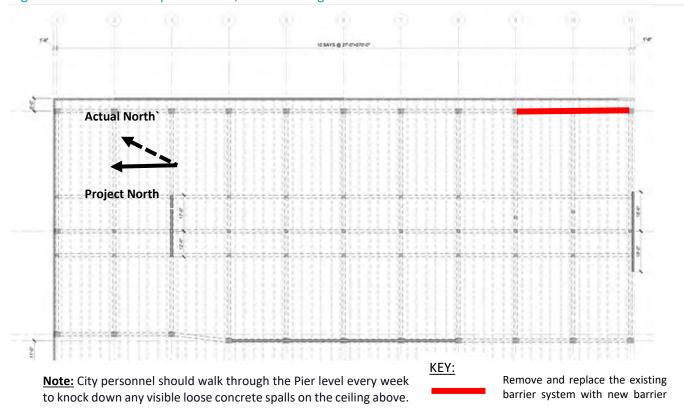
Immediate Repair location, North Parking Pier Structure – Pier Level
